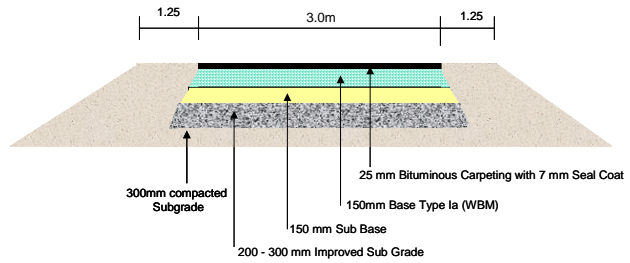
Existing Pavement Design for Rural Road 1, and Recommended Pavement Designs for Union Roads
